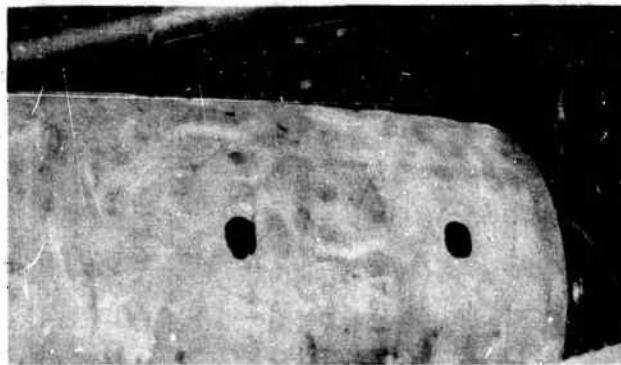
CUT IN FRAME CROSS MEMBER TO ALLOW REMOVAL OF SAND CONVEYOR DRIVE PULLEY.
